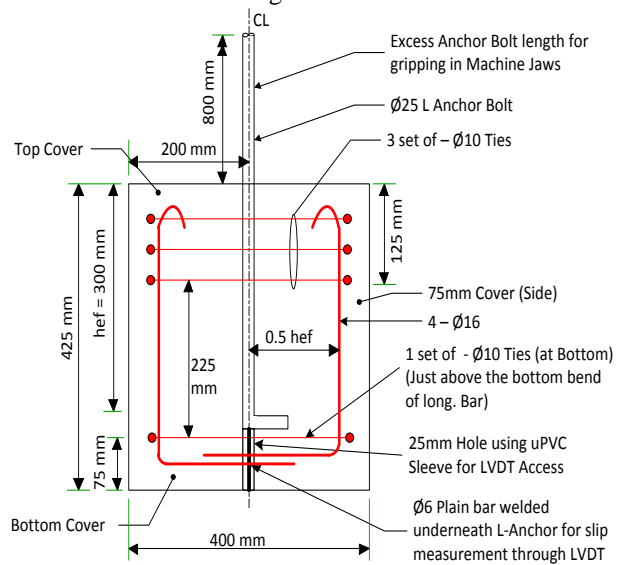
Specimen S16 with Ø25 (#8) L-Anchor and Reinforcement Details
